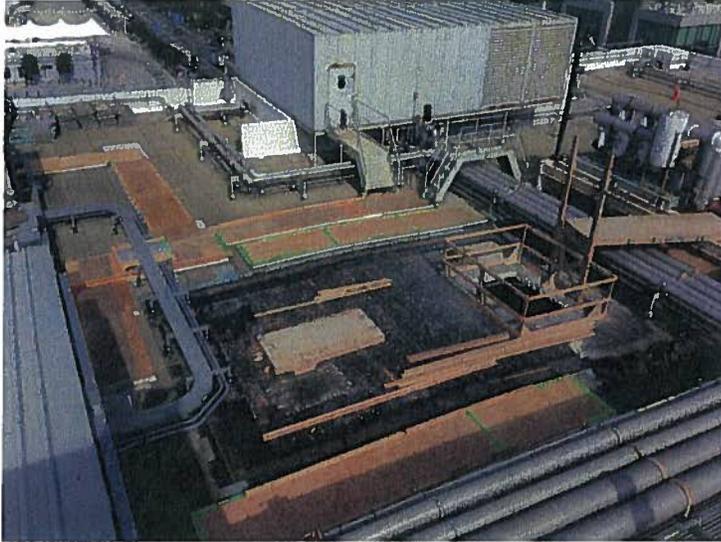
North East Roof Section. This will be an opening for a future skylight extending two floors below.
